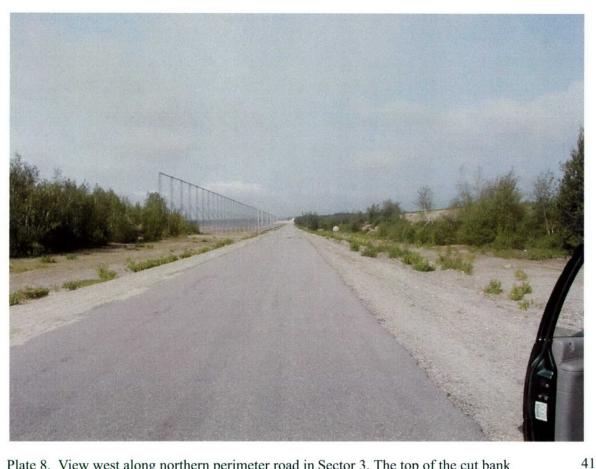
View west along northern perimeter road in Sector 3. The top of the cut bank (right) is property boundary and indicates the original ground surface elevation prior to construction.
